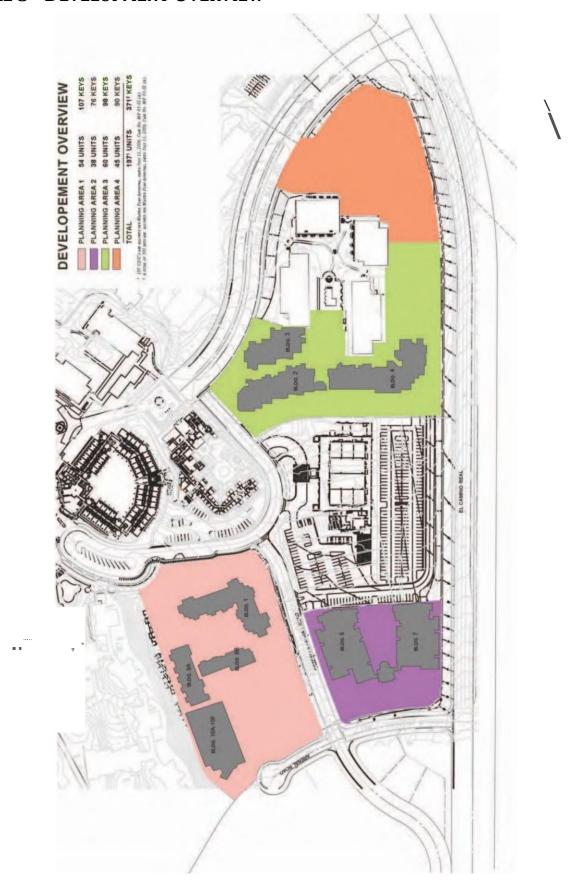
OVERALL CONCEPTUAL SITE PLAN
